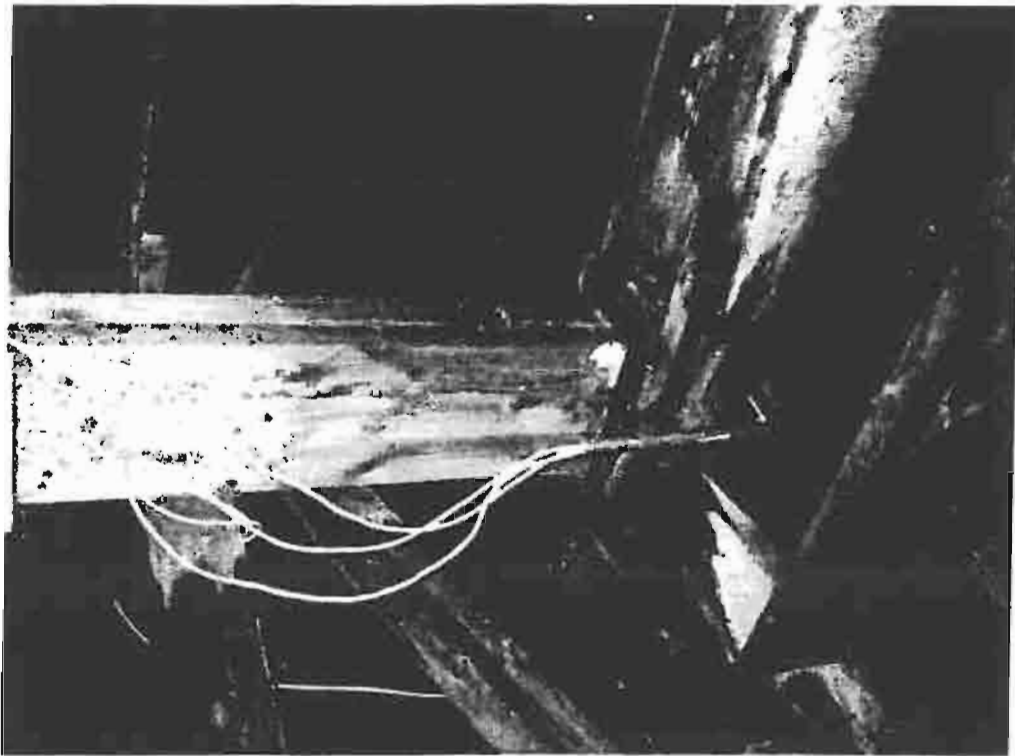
Water Stains on Roof Timber Framing. (2014-05-23)
